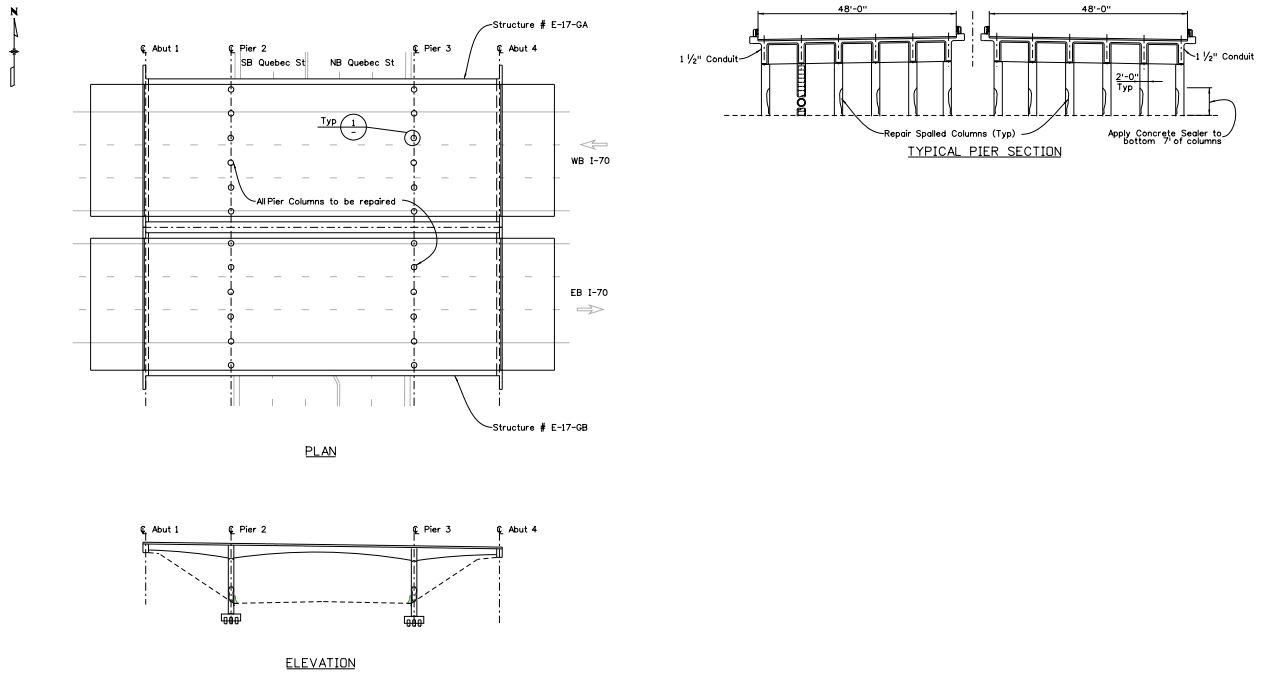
(D)-1 Sample General Layout for a Pier Cap/Column Repair
